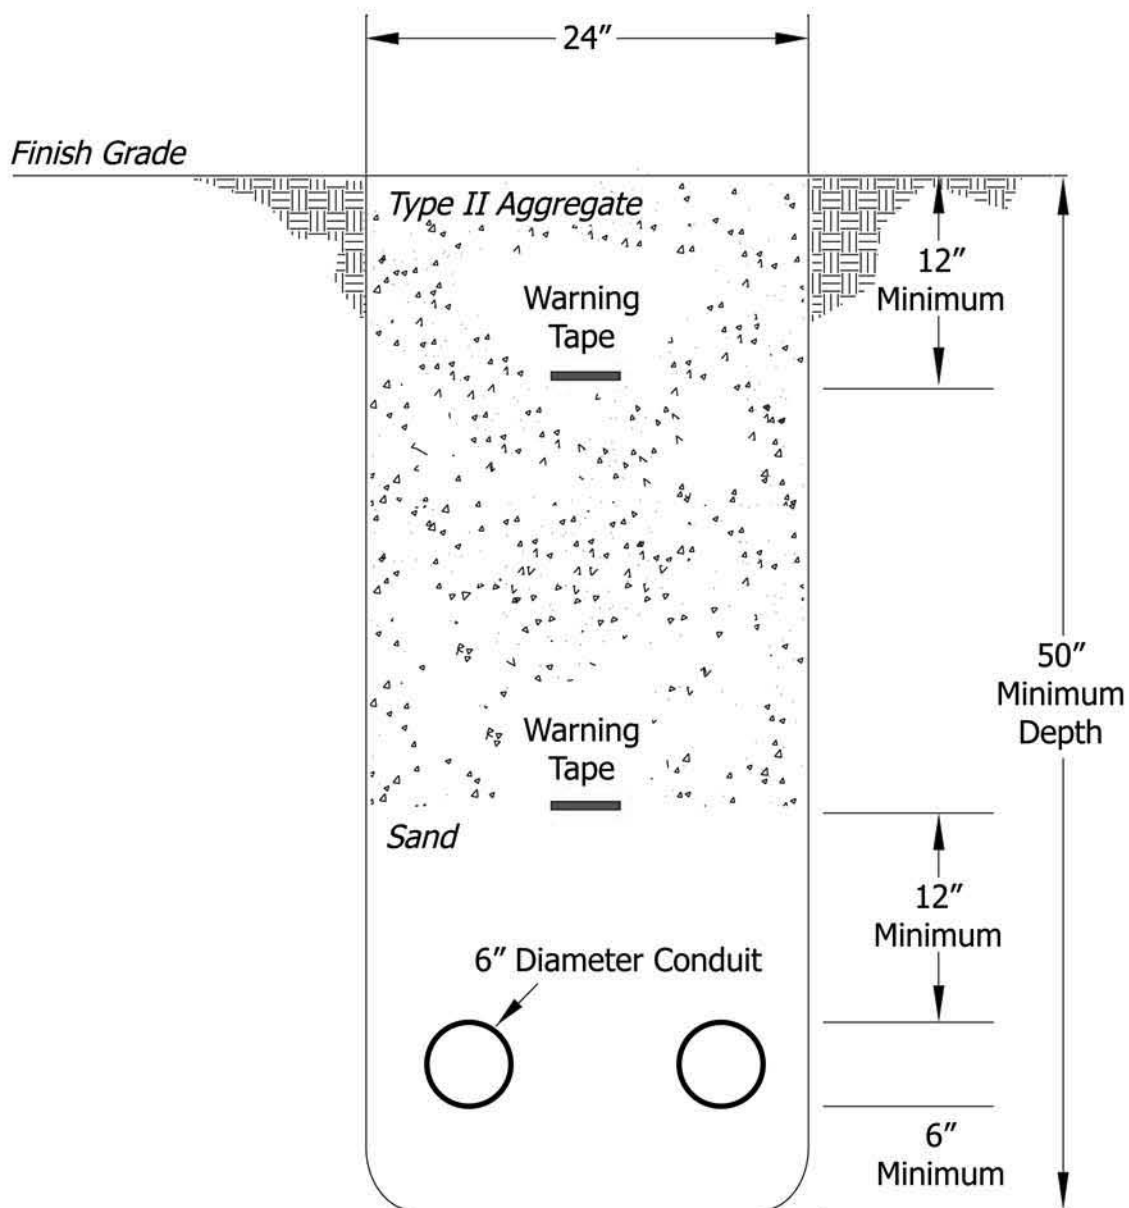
Proposed Typical Underground Distribution Duct Bank
